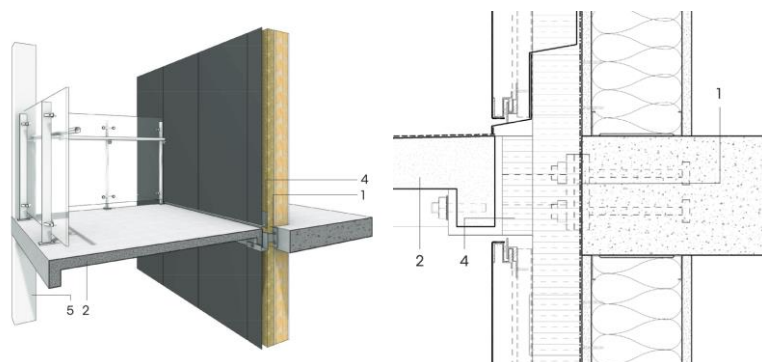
concrete slab (2) with thermal insulation (4), discrete connections (1) and structural support column (5)
